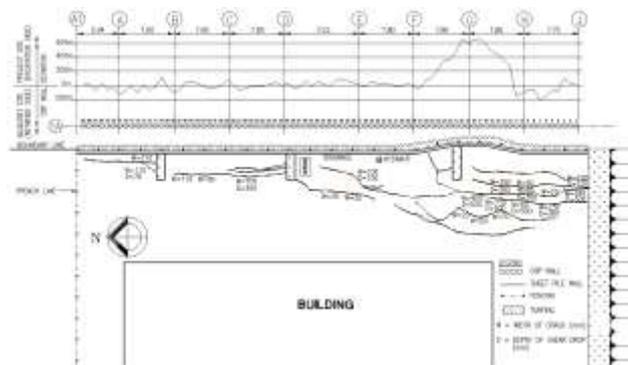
Crack Mapping on Retained Ground of Distressed CBP Wall
